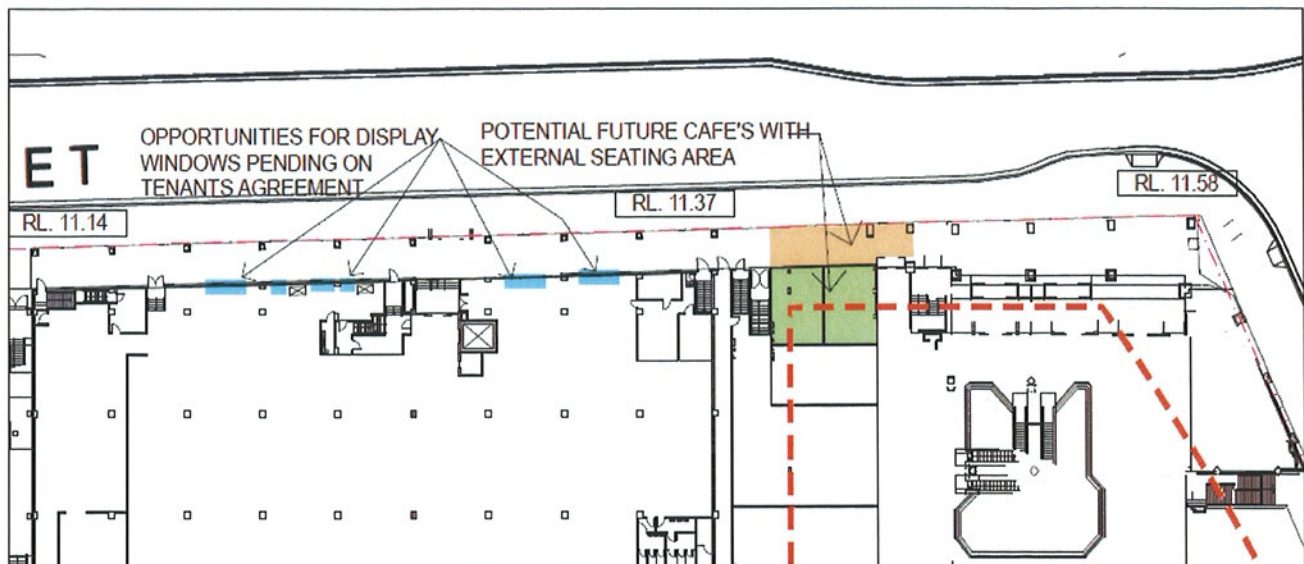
Proposed new ground floor openings to Argyle Street (source: Proponent's EA)
